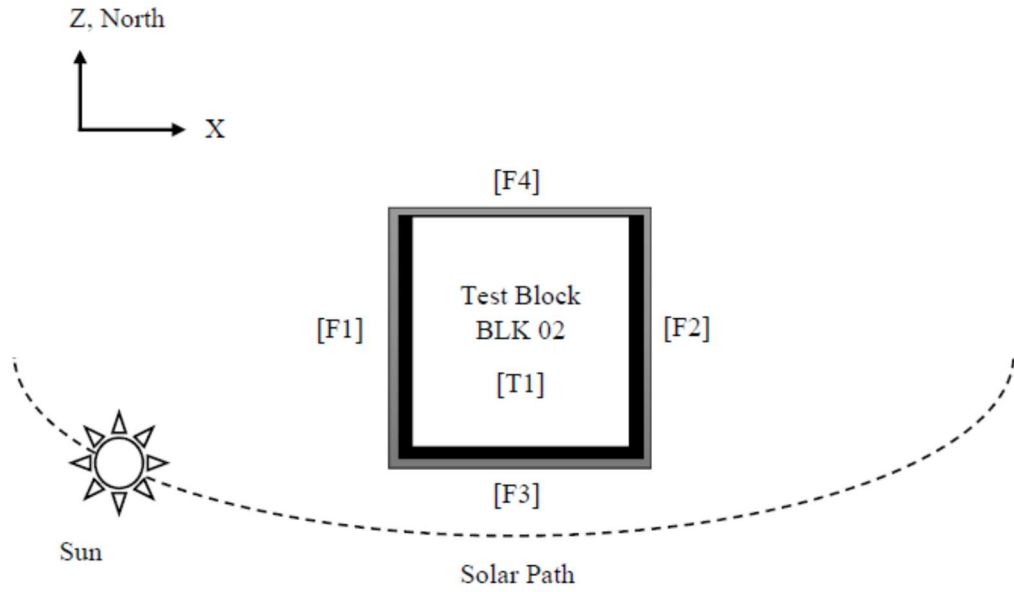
Plan View - Geometric Orientation of Test Block BLK 02
